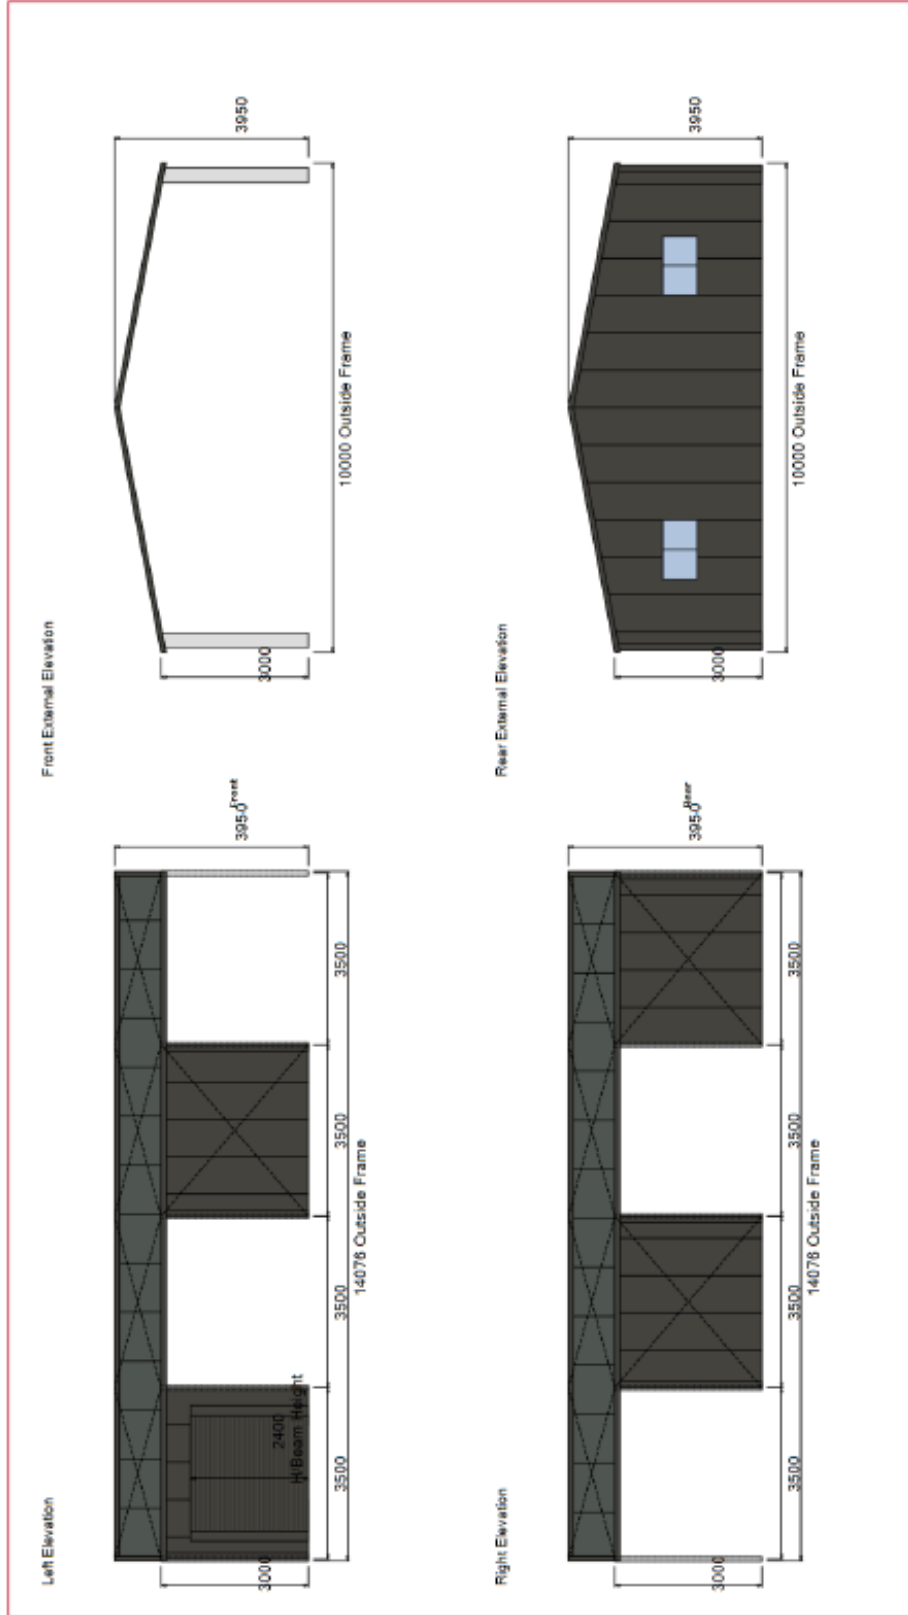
Proposed Shed Plan (Source: Stratco Sheds, May 2024)
